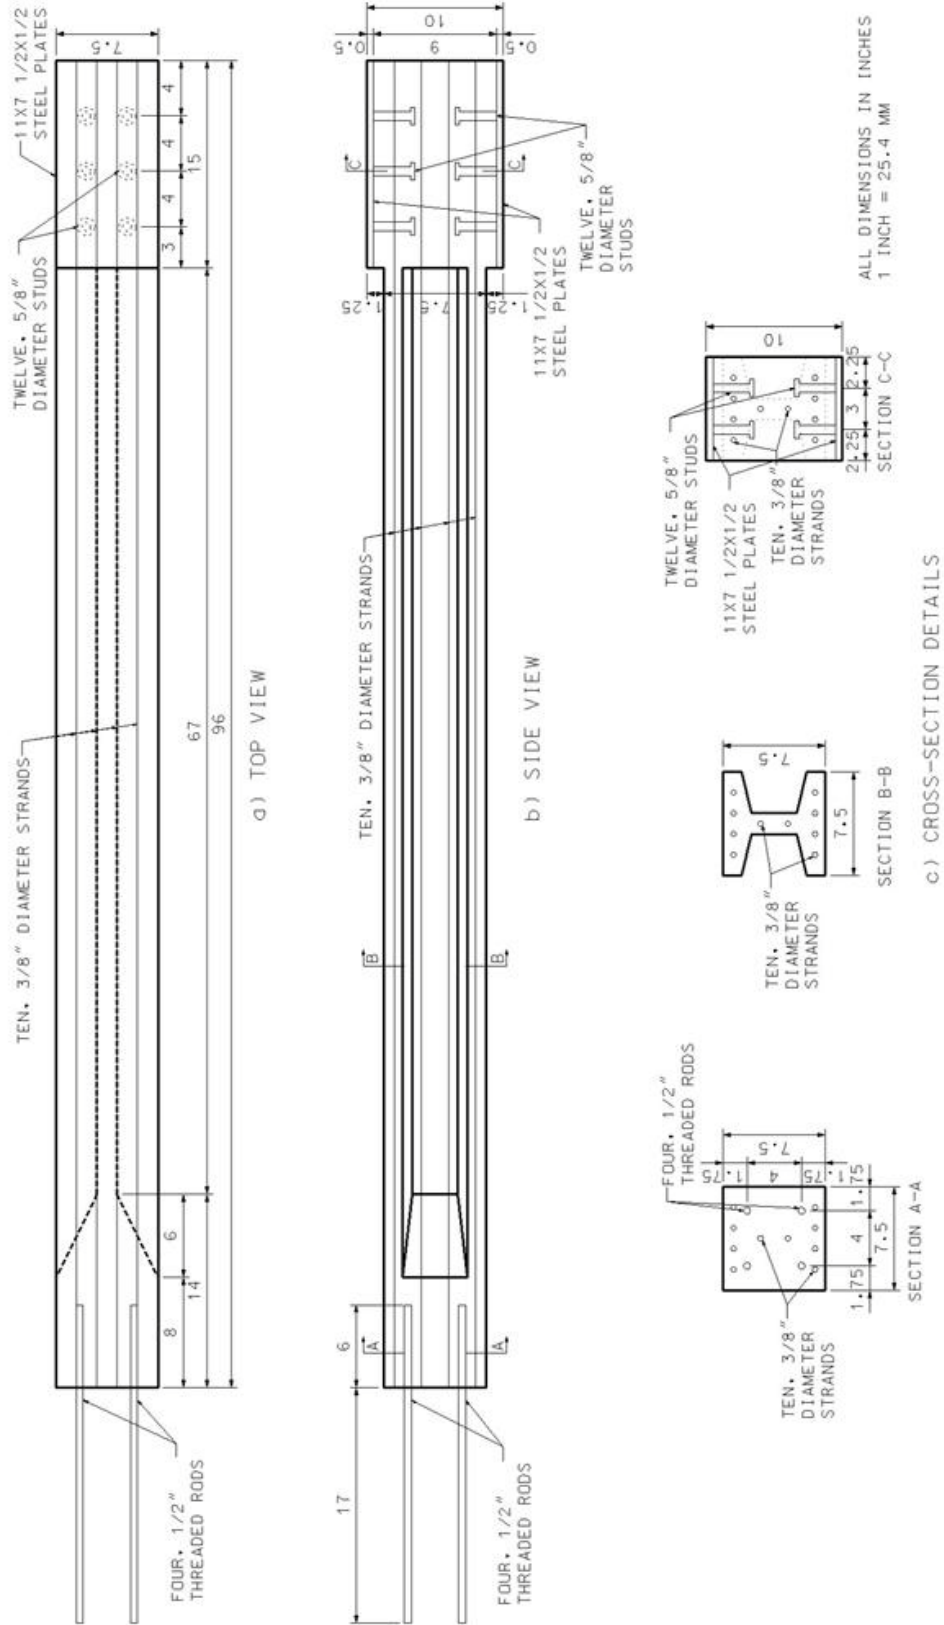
Dimensions and reinforcement details of the 8-ft (2.4-m) long UHPC test units for laboratory test
